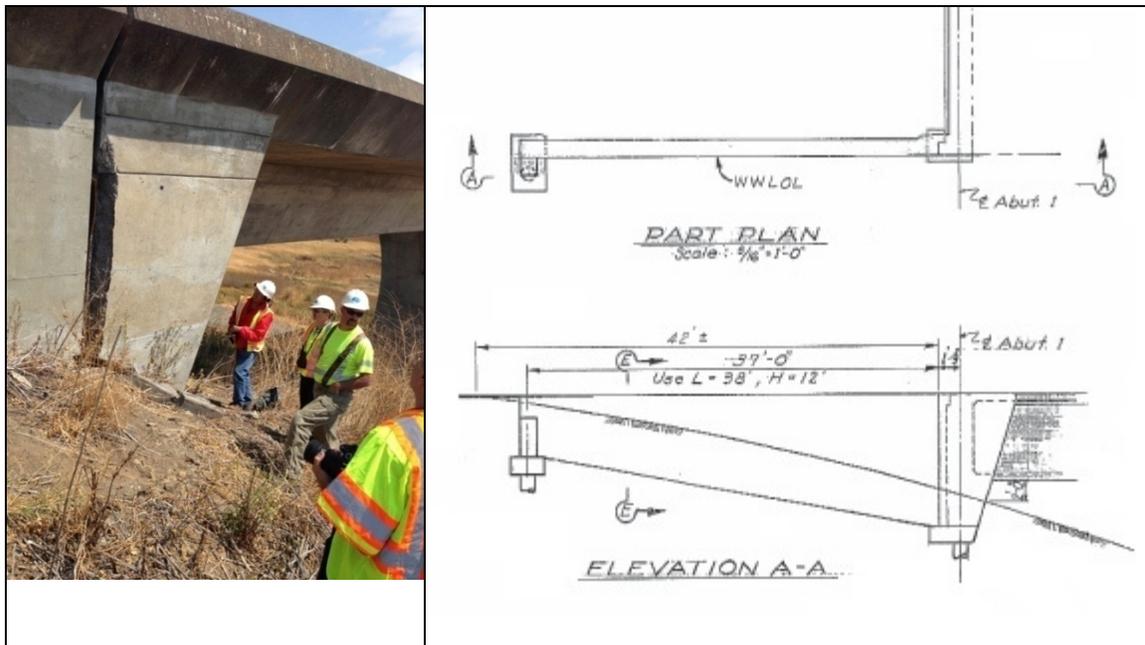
Abutment 14 concrete spall on the Napa River Bridge and Overhead.
